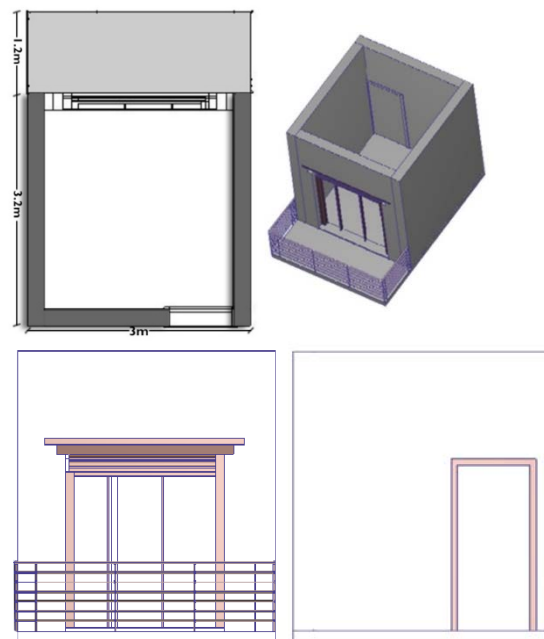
a) Plan, b) View, c) Front Elevation & d) Rear Elevation of case -II
